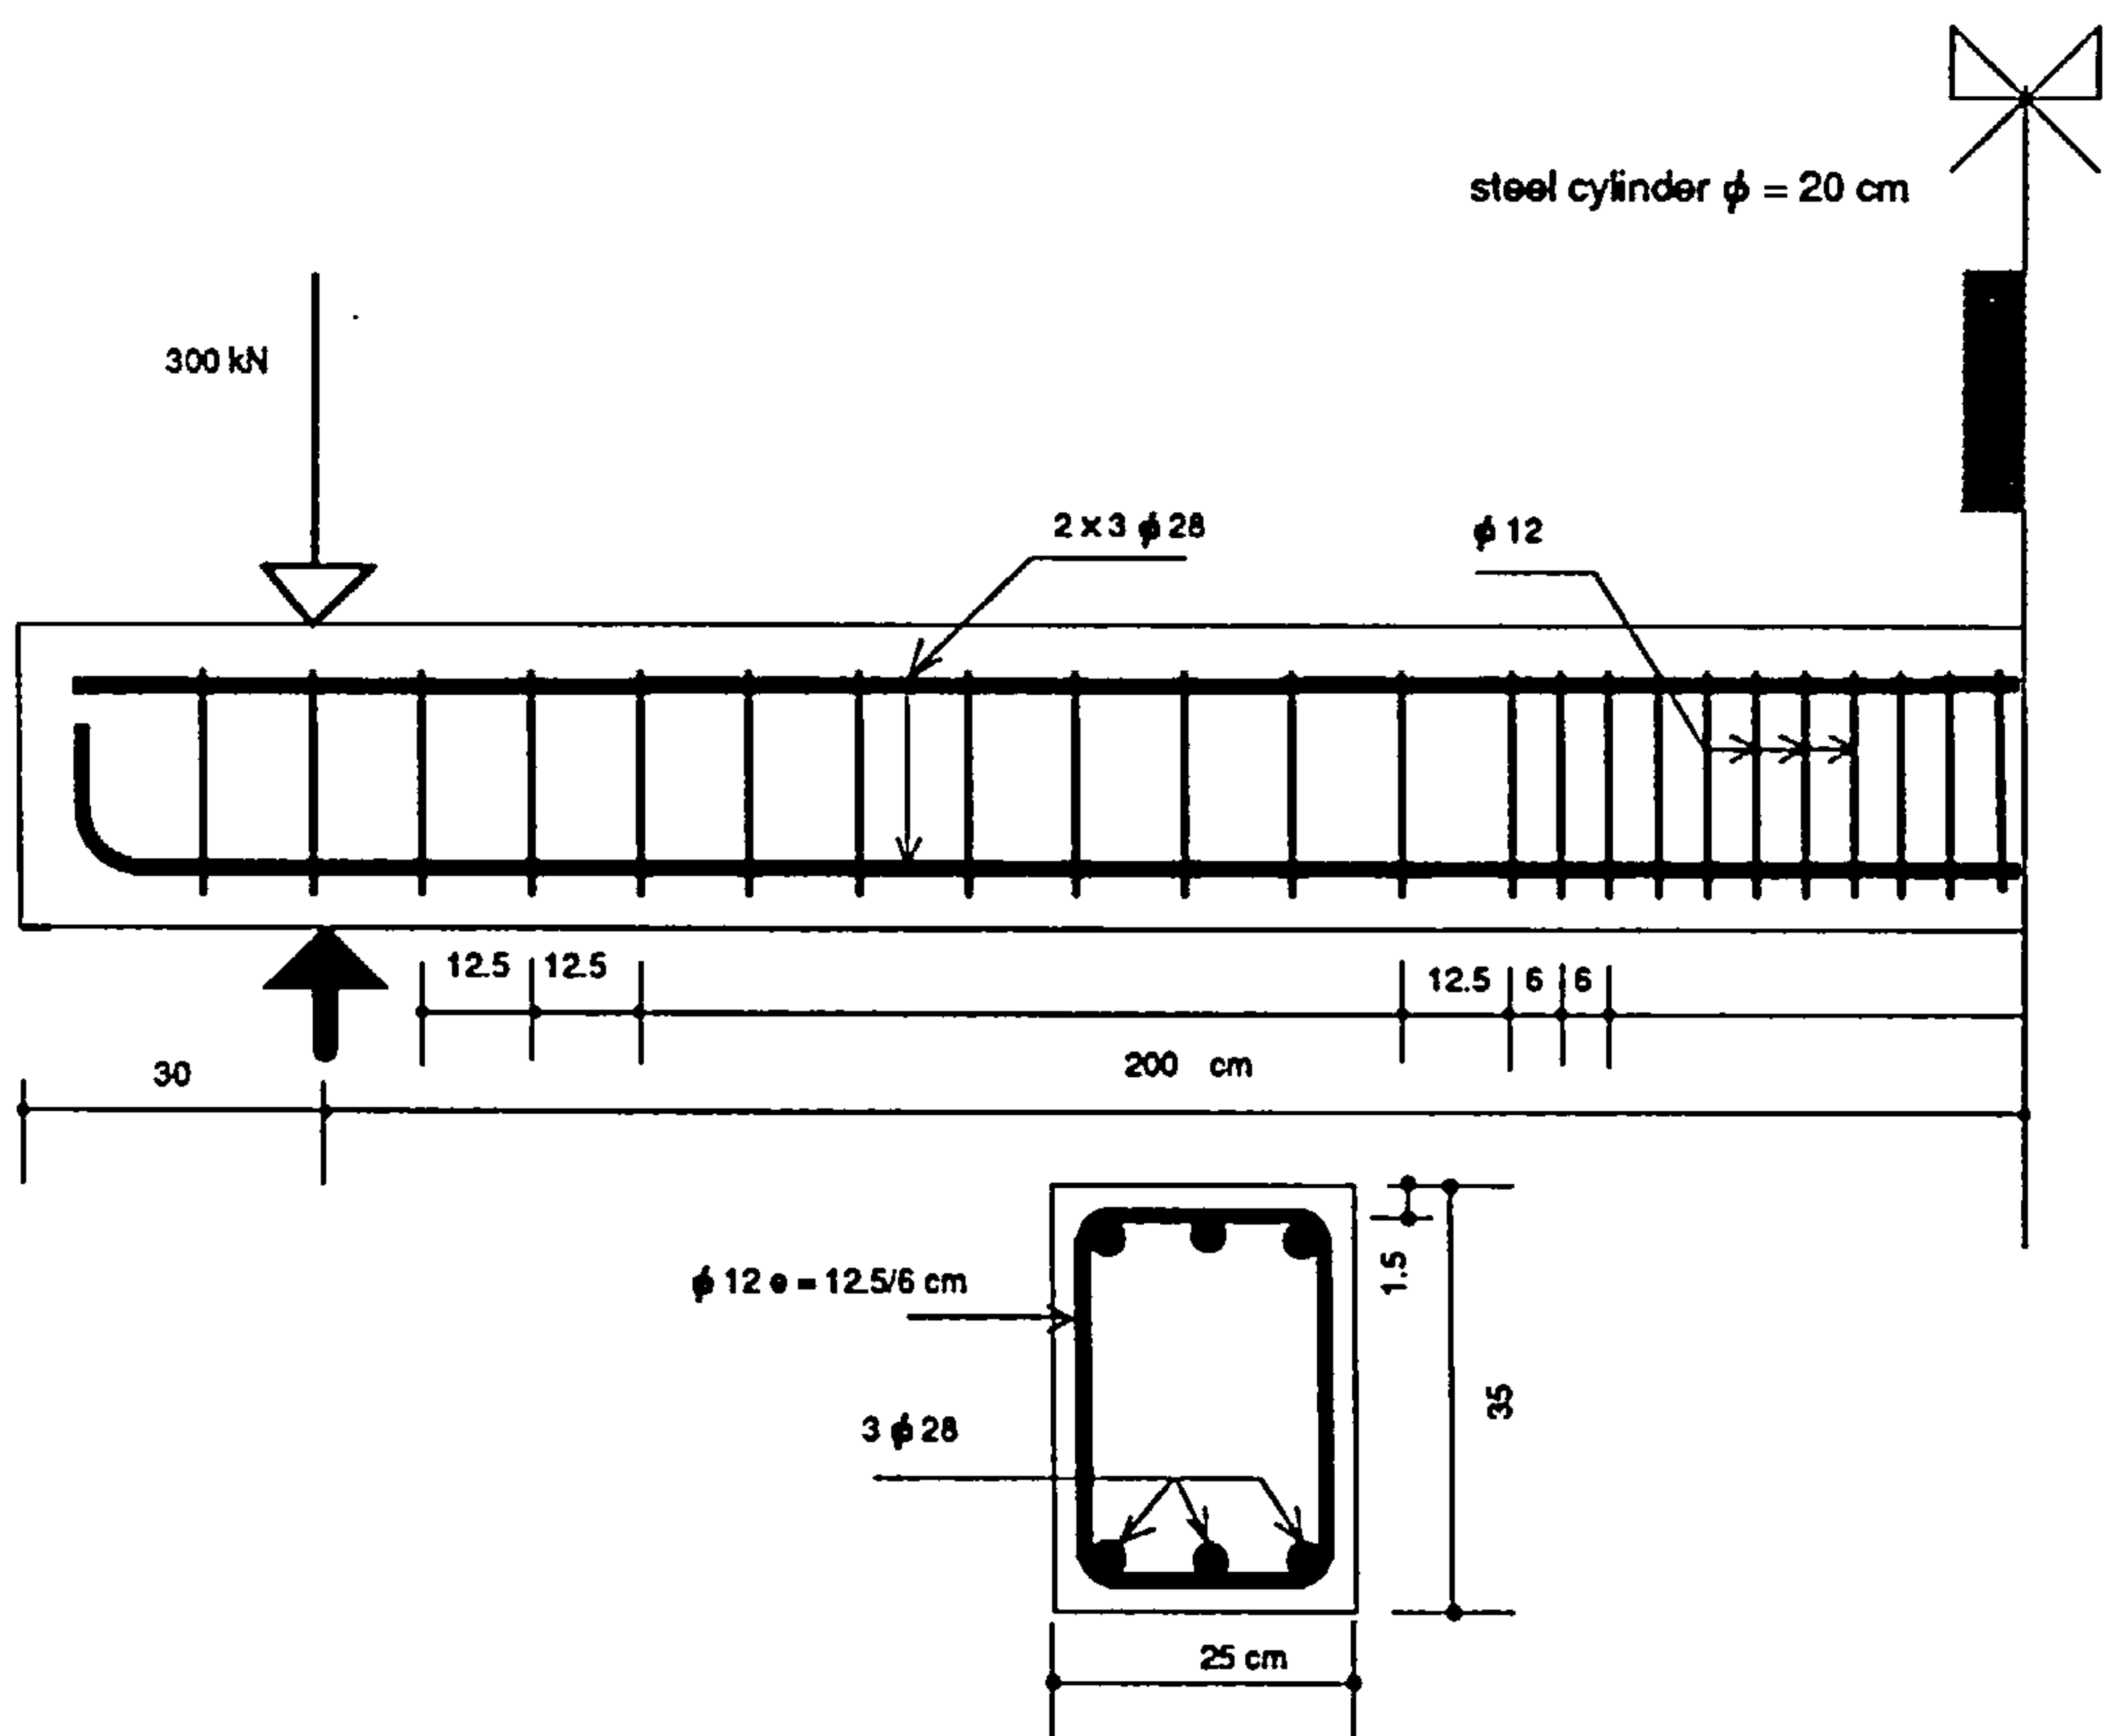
Dimensions, reinforcement and loading arrangement for the beam tested by Eibl et al [151]
